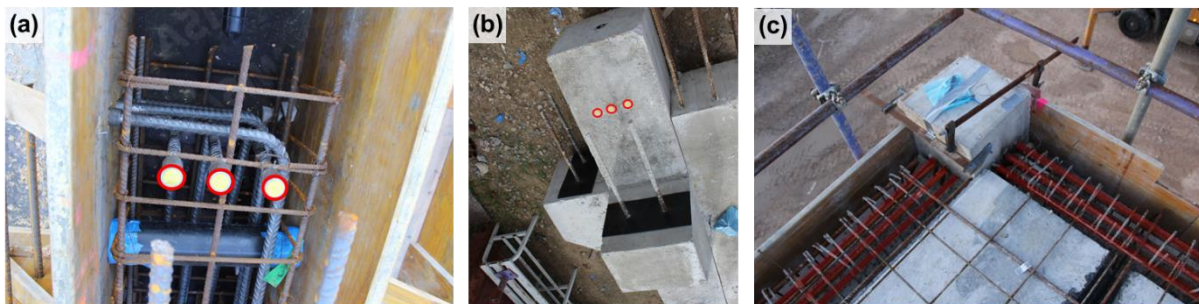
(a) Anchors and threaded couplers in corner column prior to casting; (b) precast corner column; (c) Corner column in position with ties connected to anchors prior to casting topping layer (All photos courtesy of Manuel Buitrago).
